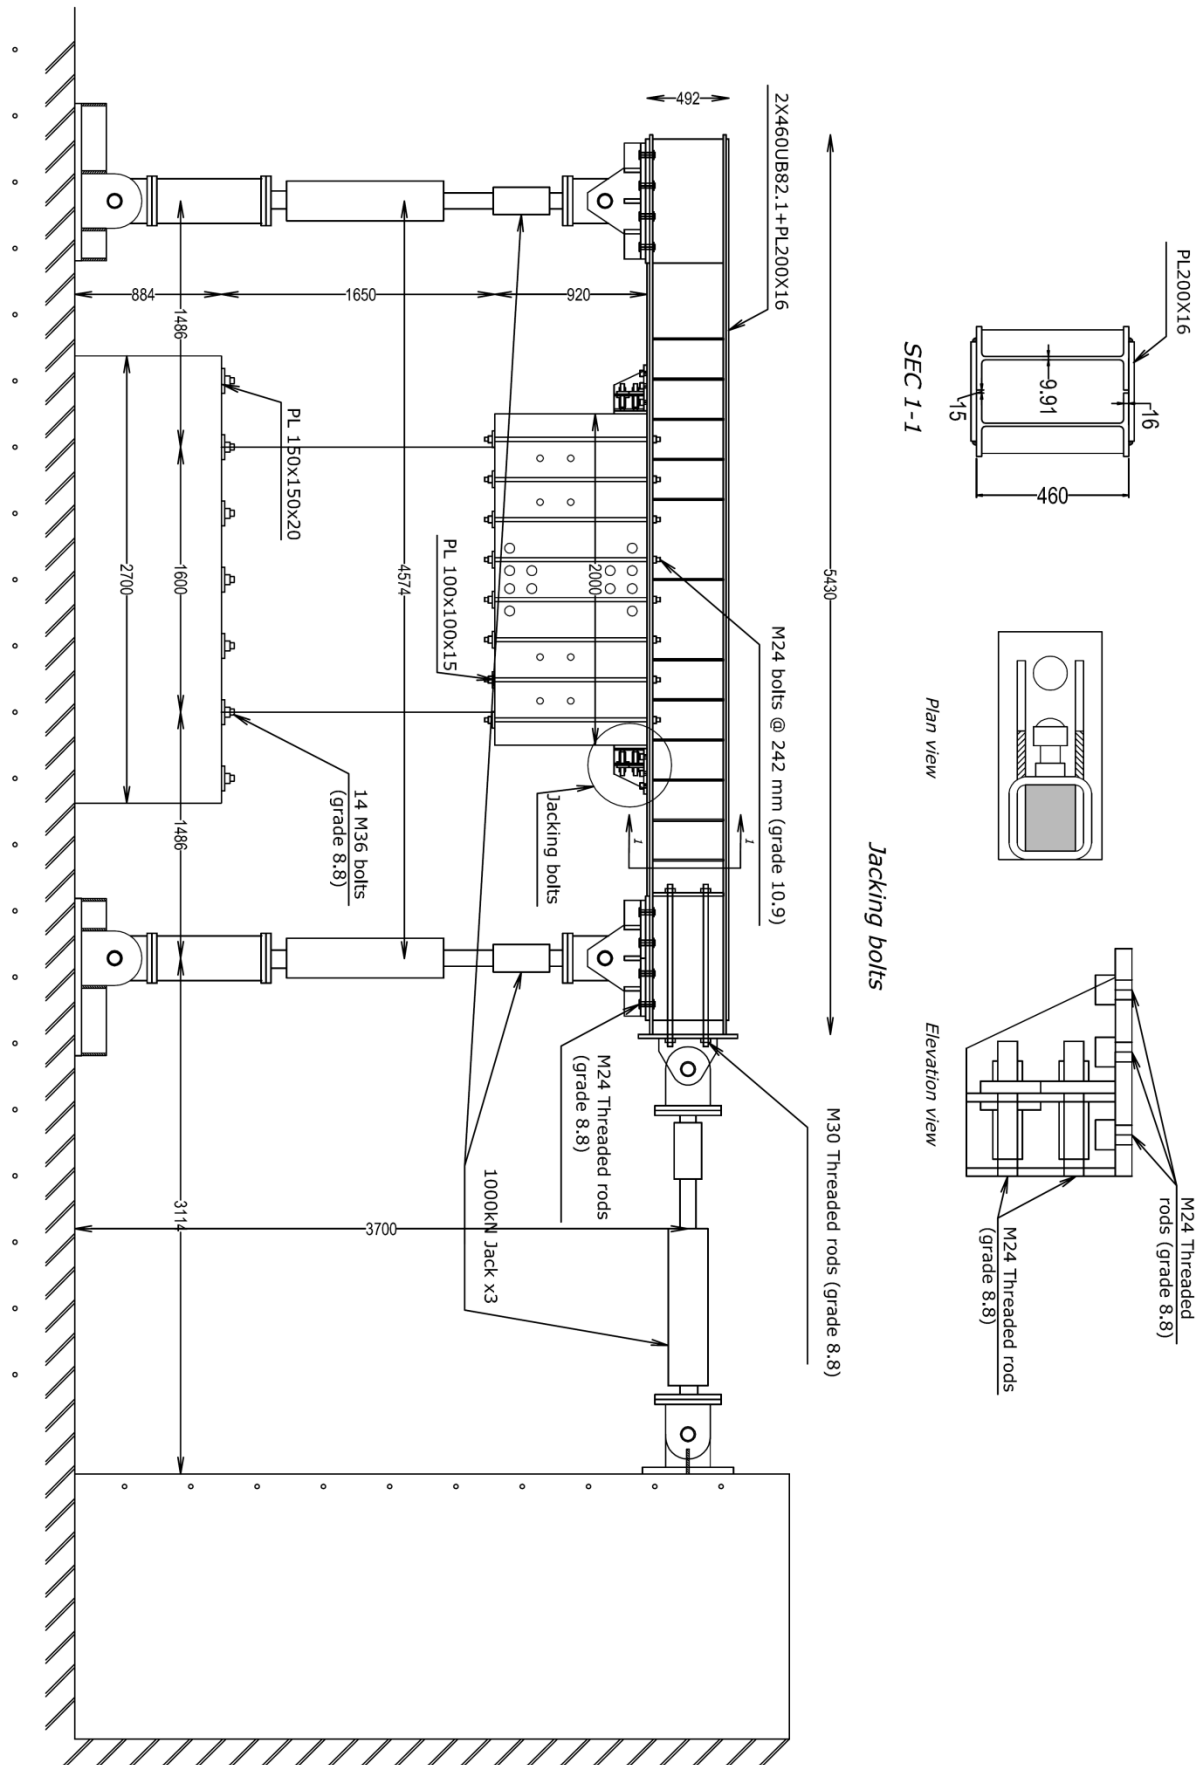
Schematic view of the test setup – Elevation (in-plane; front view)
